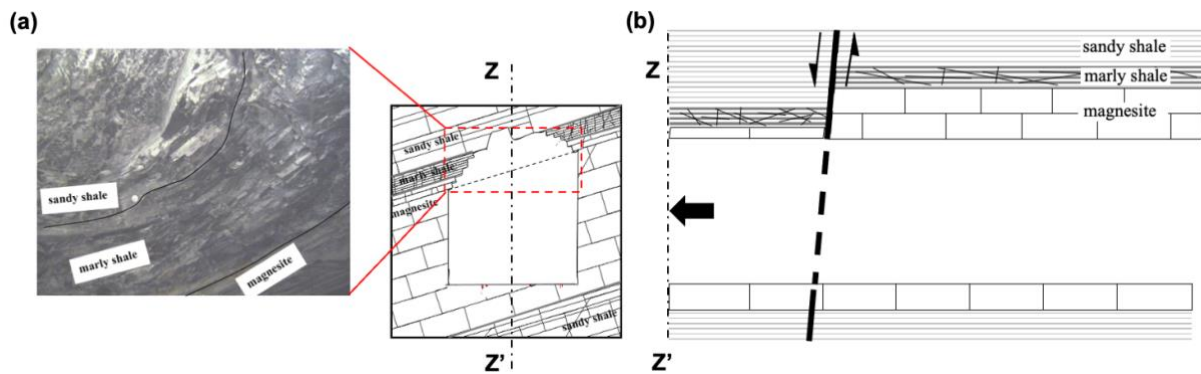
(a) Photo and schematics of the vault-shaped collapsed area; (b) longitudinal section view of the room, illustrating the geological conditions for the occurrence of the roof collapse.
